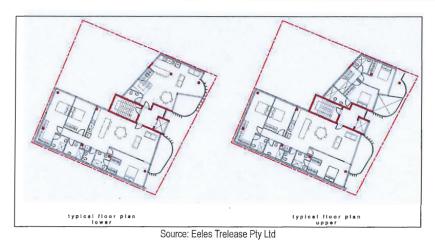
Typical Floor Plan Layout of Potential Development on Subject Site
